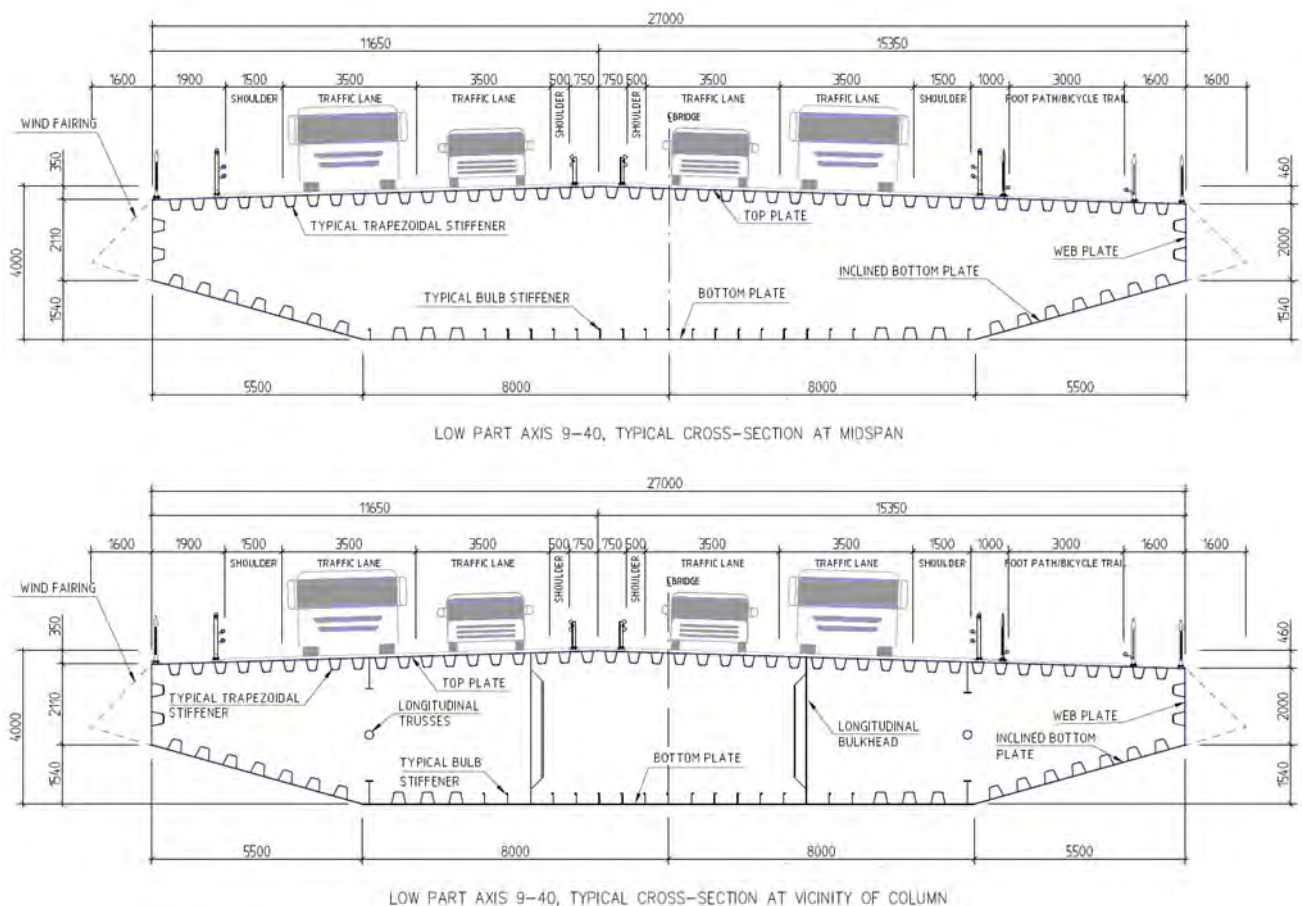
Geometric shape of bridge girder at midspan and in vicinity of column
